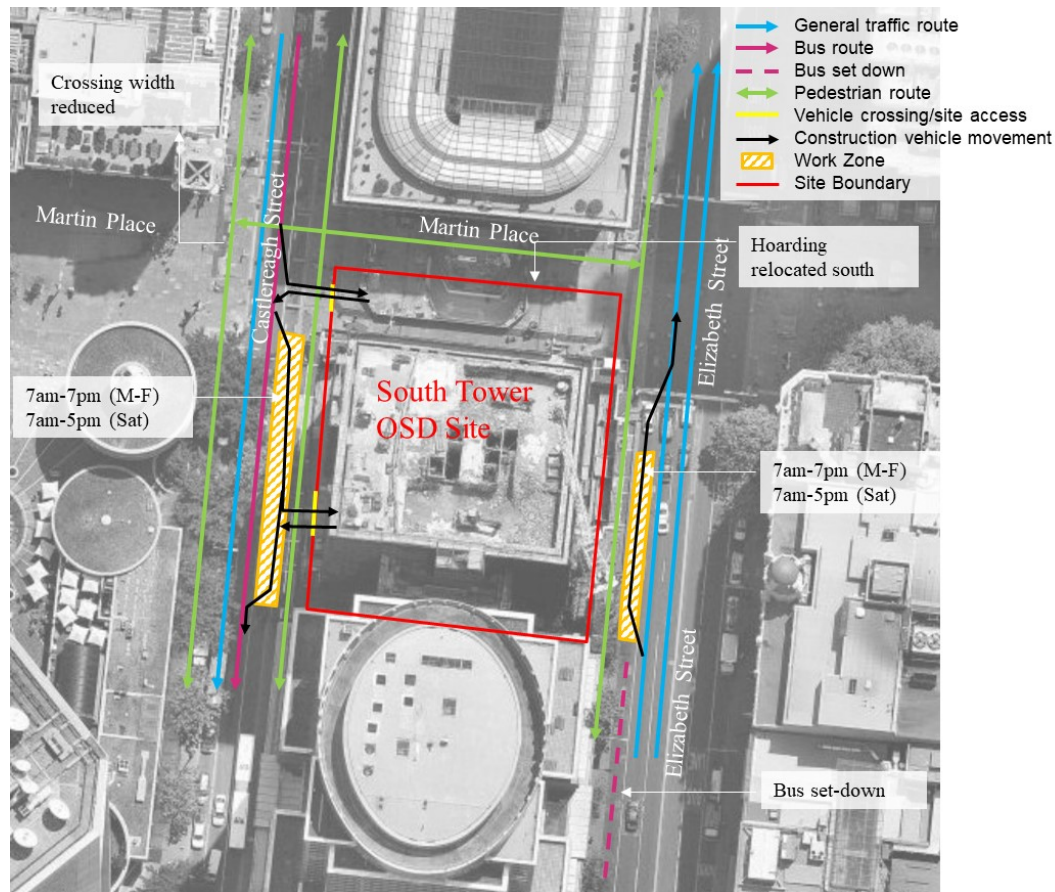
TSP 3 Site Access and Traffic Staging Plan
